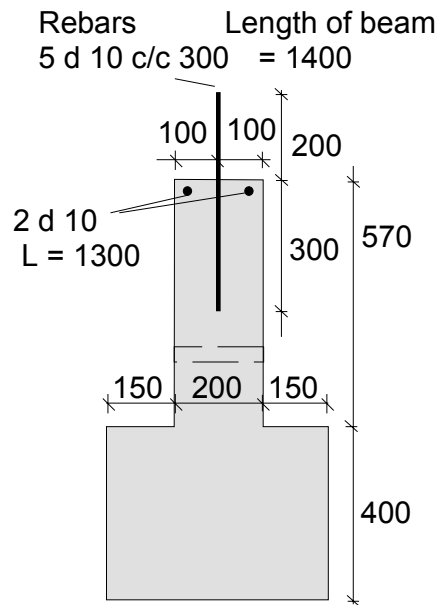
Supporting beams in test ST200E1M. The target grade of concrete was K30. $d 10$ refers to reinforcing bars with diameter 10.
